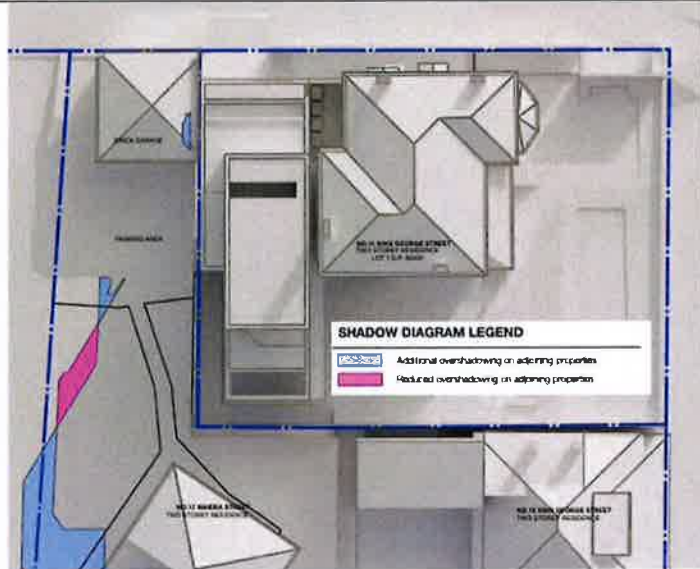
Proposed Shadow Diagram 21 June 3pm
